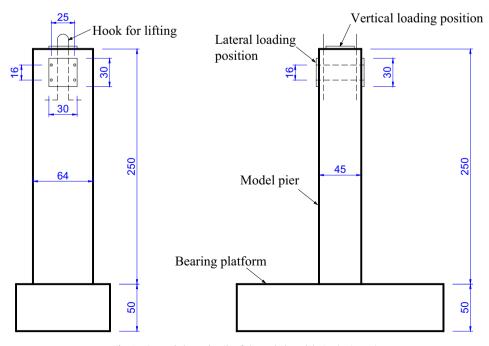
Size and shape details of the scaled model pier (unit: cm).
